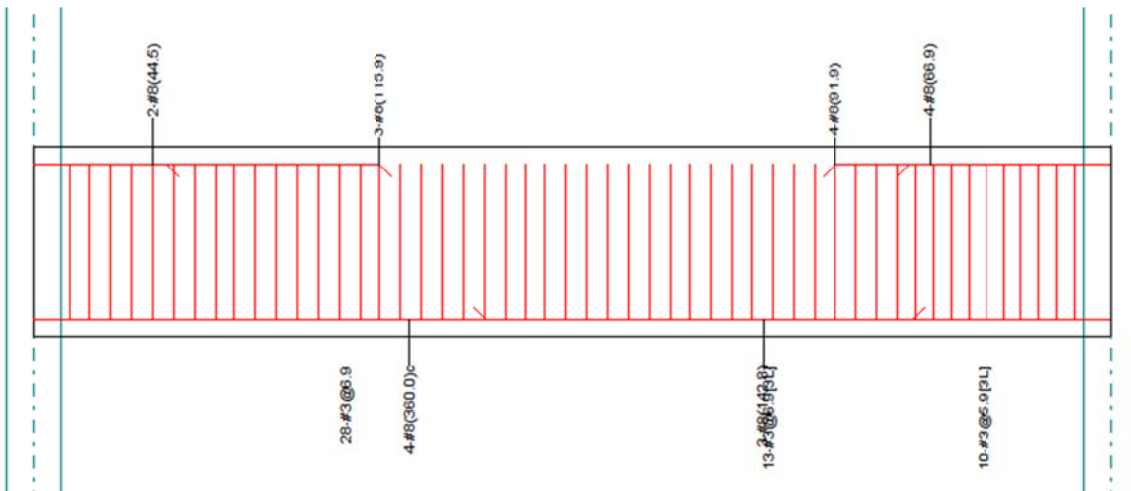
spBeam Transfer Girder 3 Reinforcing Diagram
